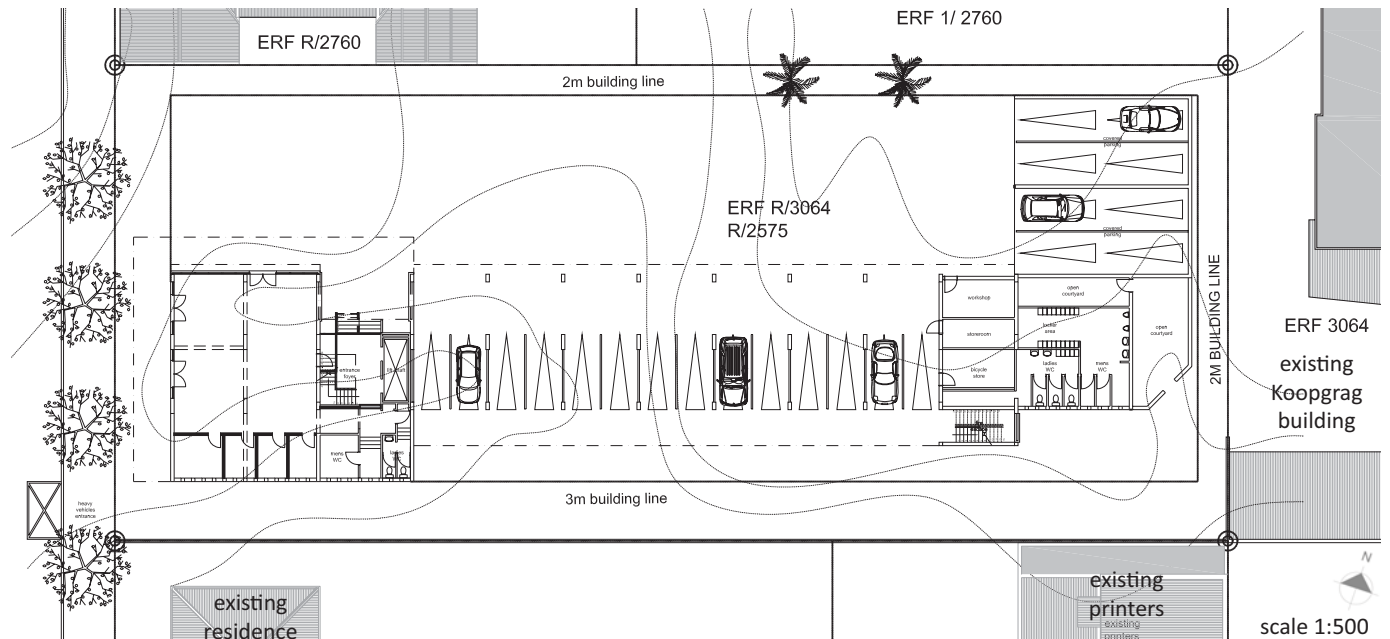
The ground floor plan of the Woltemade building after alterations were made to the internal layout of the street edge in 1959
